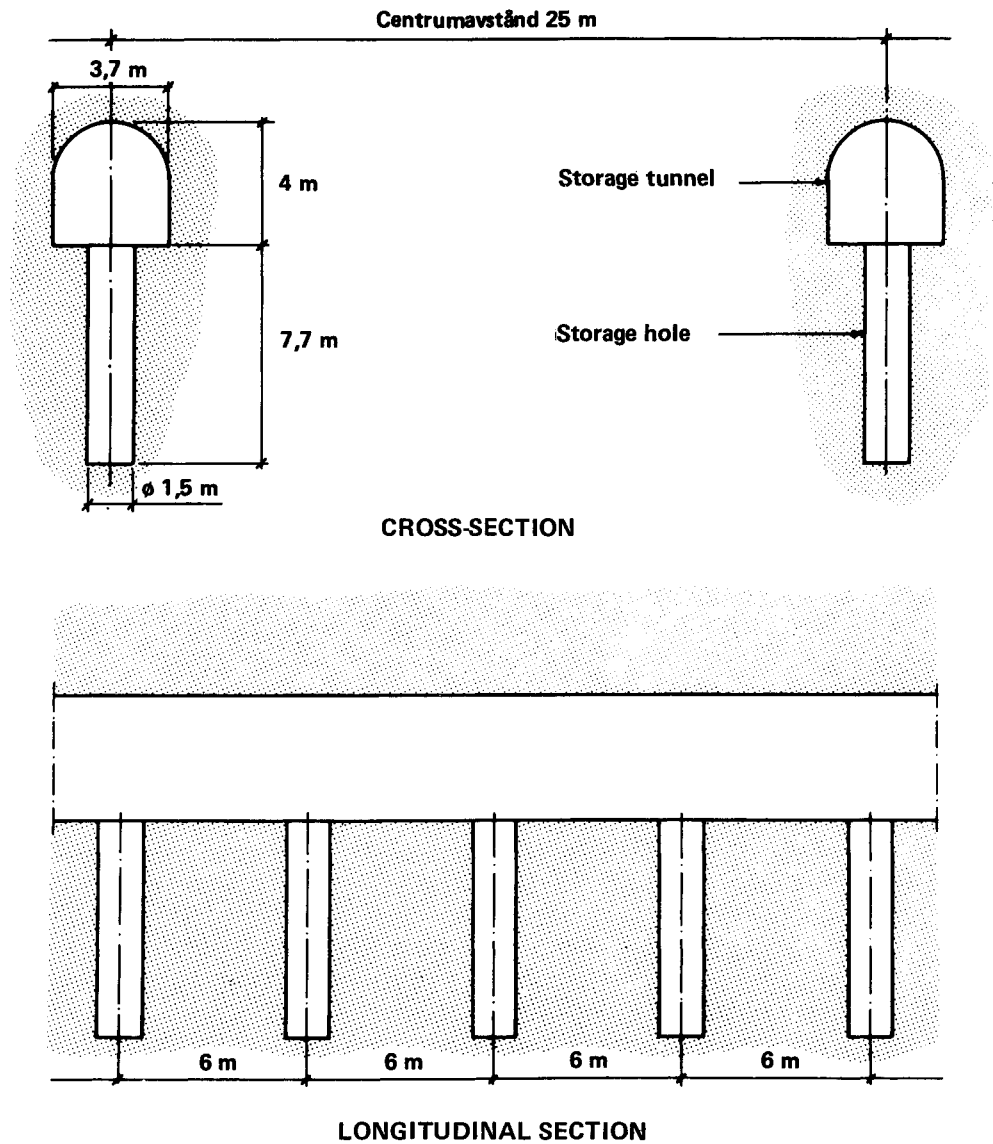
Cross-section and longitudinal section of storage tunnels in the final repository. Each storage hole is designed for one canister.
